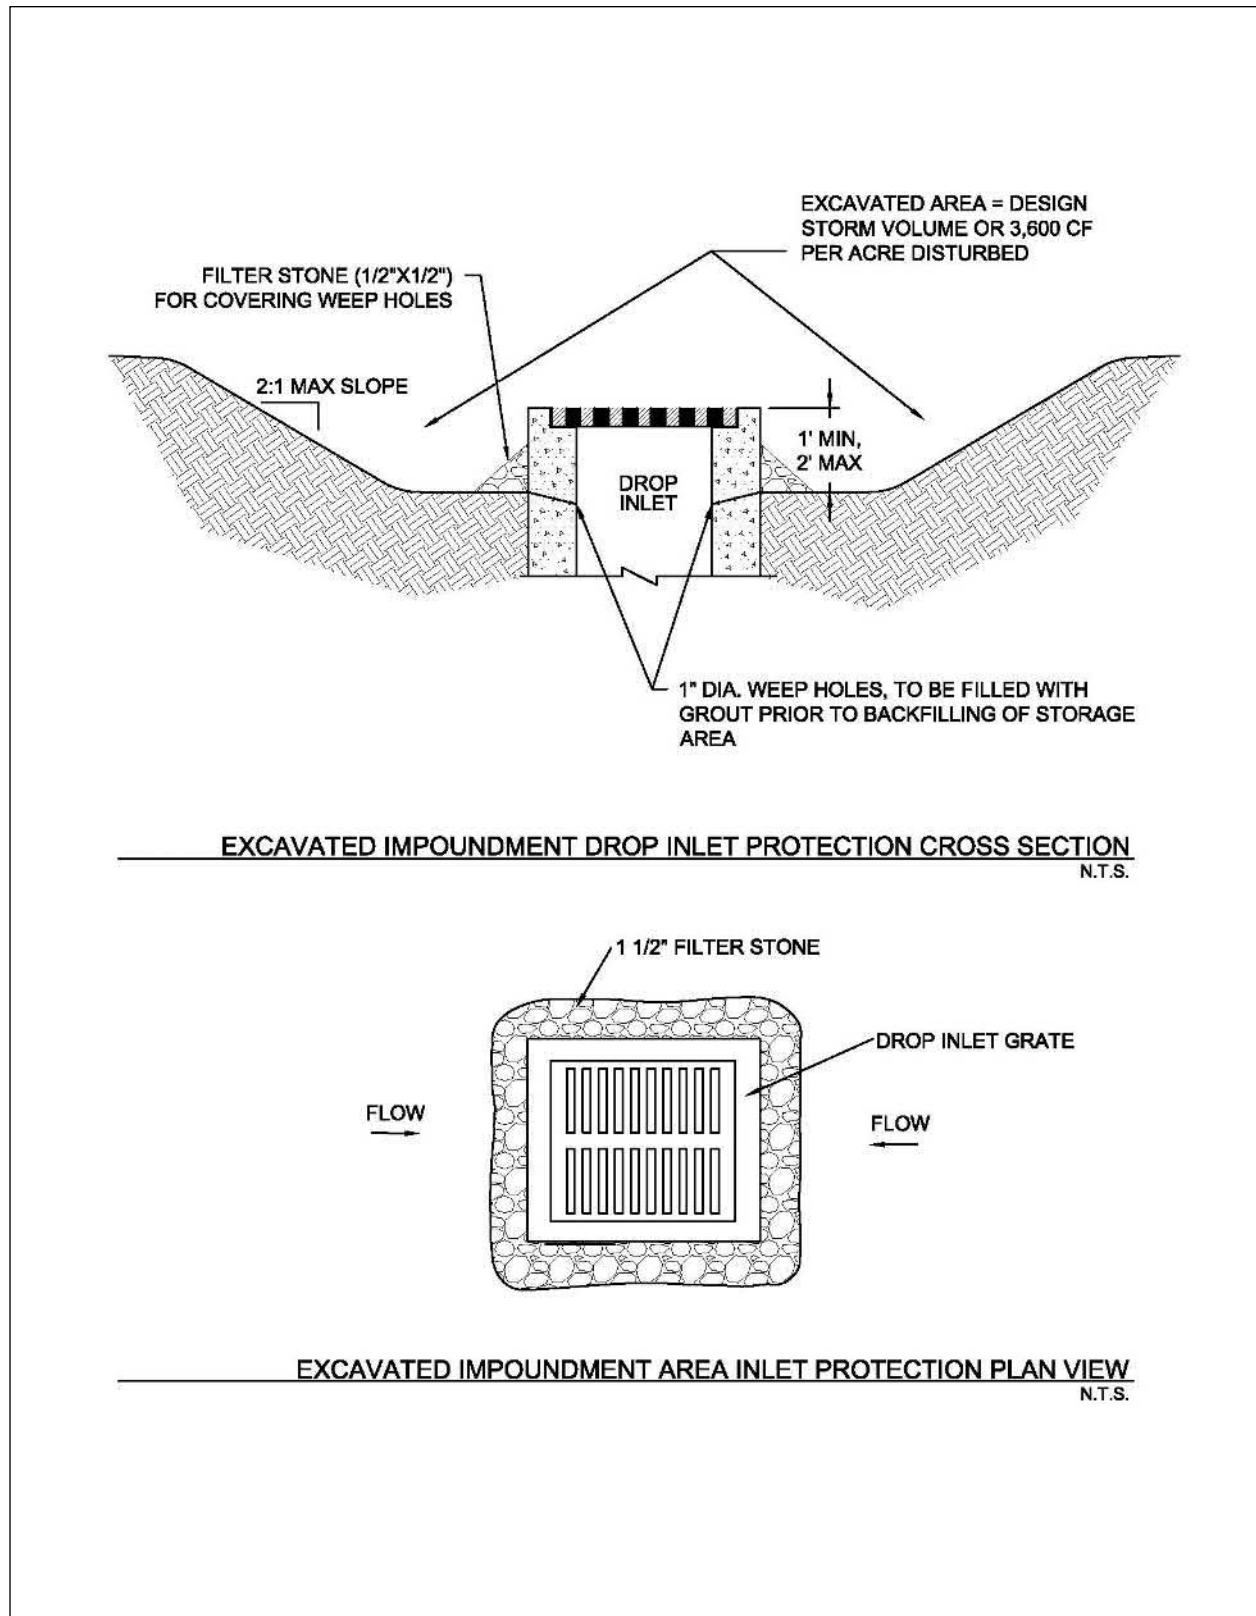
Schematics of Excavated Impoundment Area Inlet Protection
